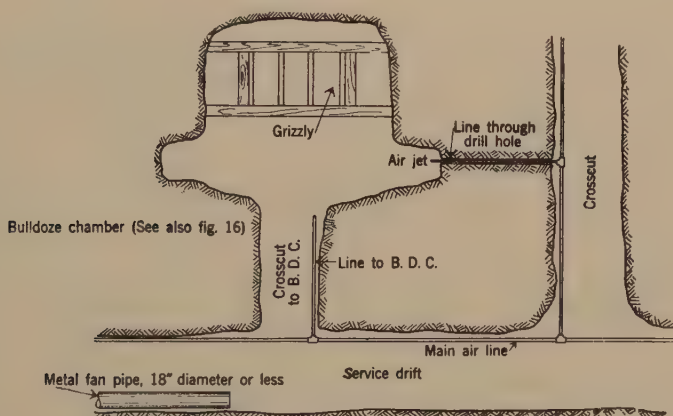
PLAN SHOWING VENTILATING SYSTEM IN BULLDOZING CHAMBER.
